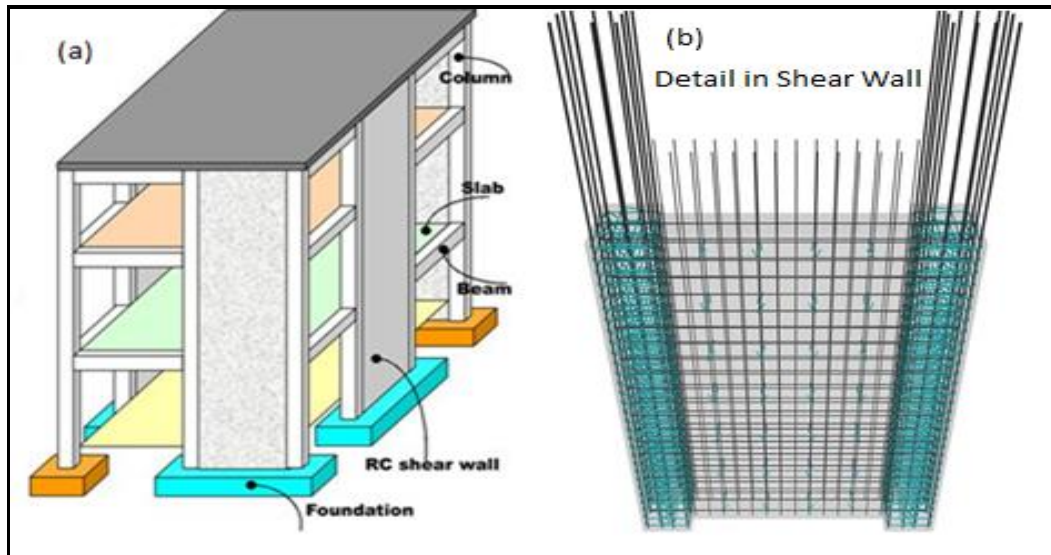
Shear Wall System in Building with Detail in Shear Wall (URL11)
